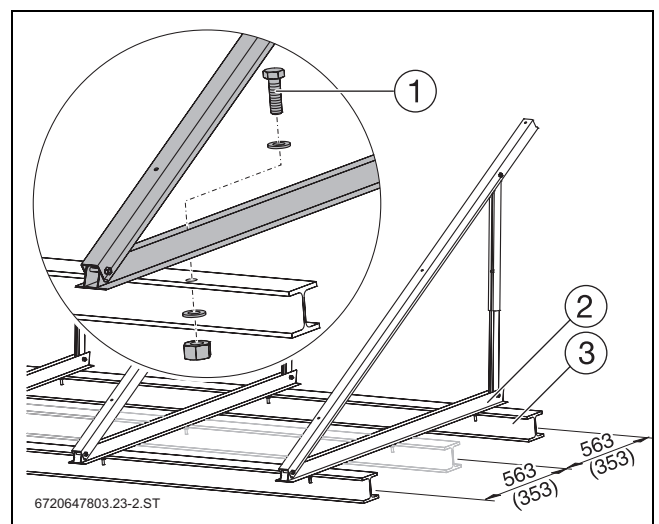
Flat roof frame on double T-beam girders, dimensions in mm
